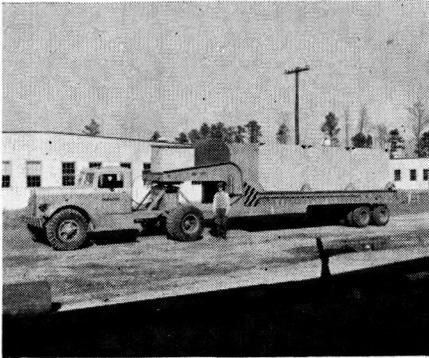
Loaded Trailer used for Reaction in Plate Loading Tests
